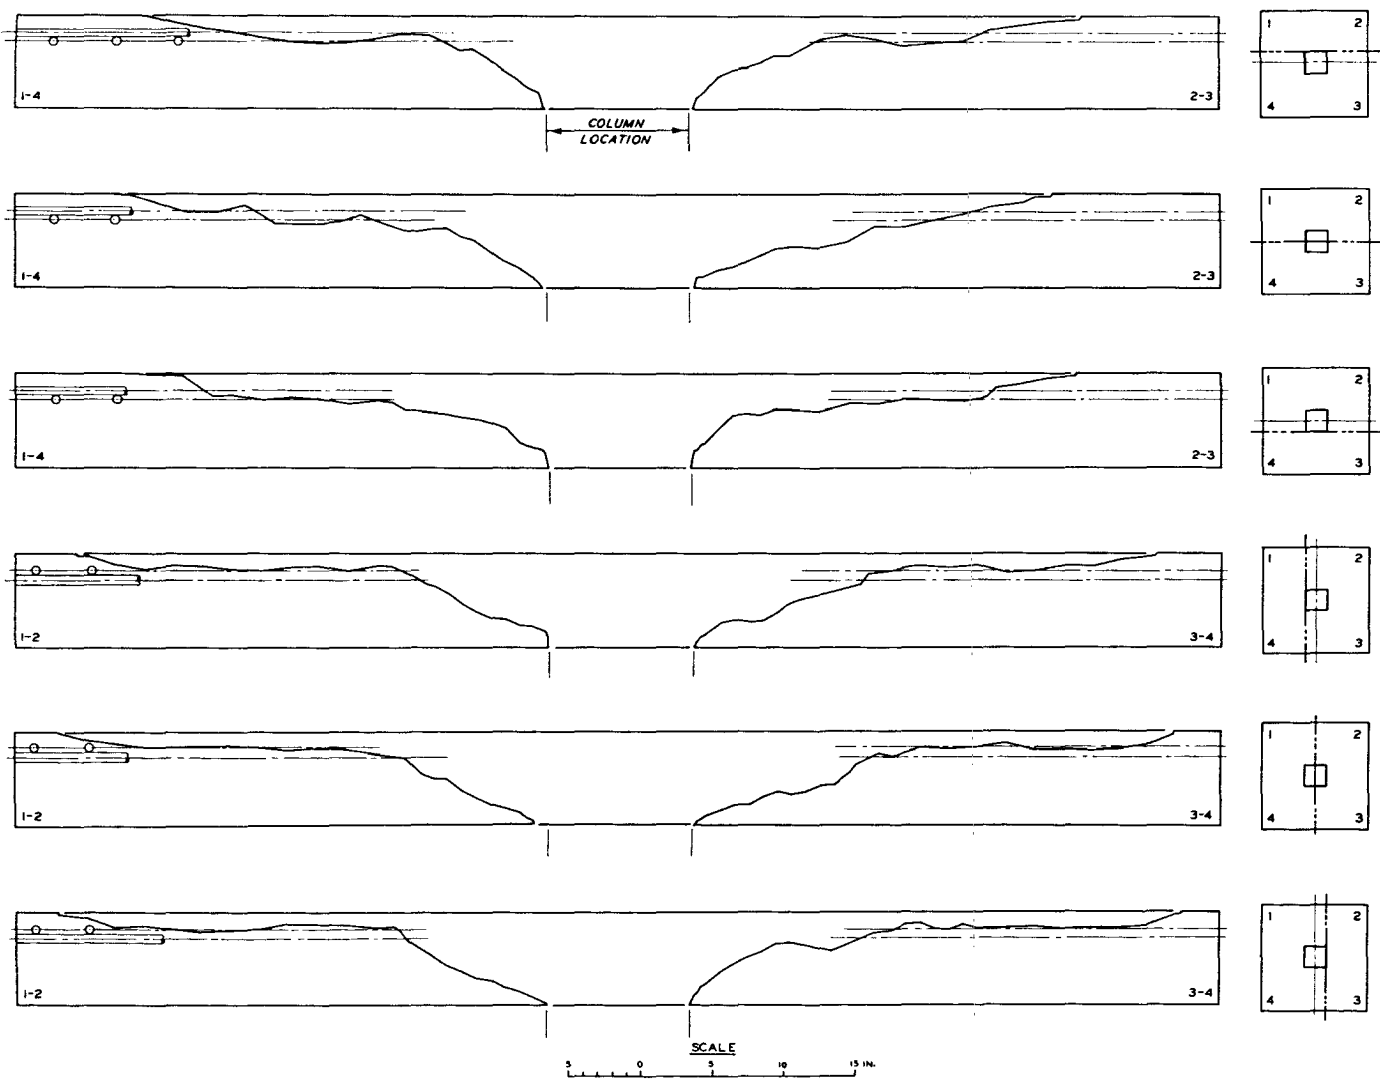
Profiles of slab failure surface, Specimen D2150-1.
